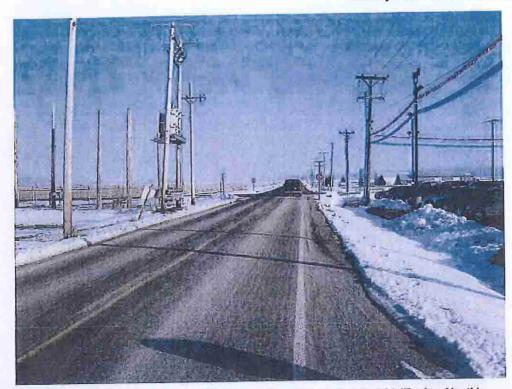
Supplement to Figure 6: Intersection U.S. 36 & S.R. 814 (Facing North)
